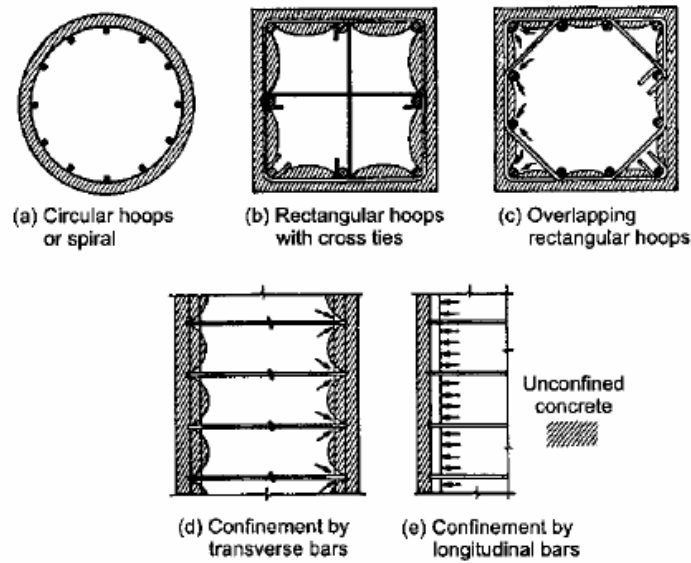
Reinforcement in column for shear resistance, concrete confinement and prevention of longitudinal bars buckling
